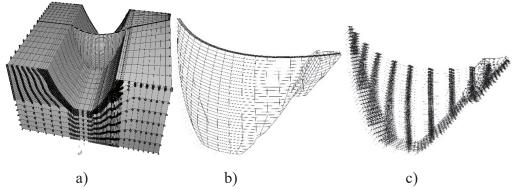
St. Petka dam model. A) Spatial view from stream side, b) Discretization of the dam body and the concrete block, c) Interface elements at contact dam-foundation and in at contact concrete-grout mix in dam joints.
